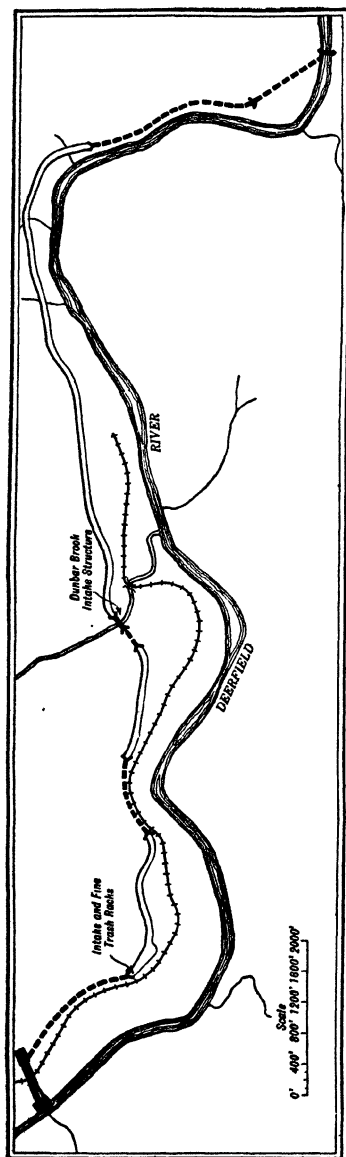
Hoosac Tunnel Plant No. 5, New England Power Co., Deerfield River, Mass. Three 7500 H.P. Units.
